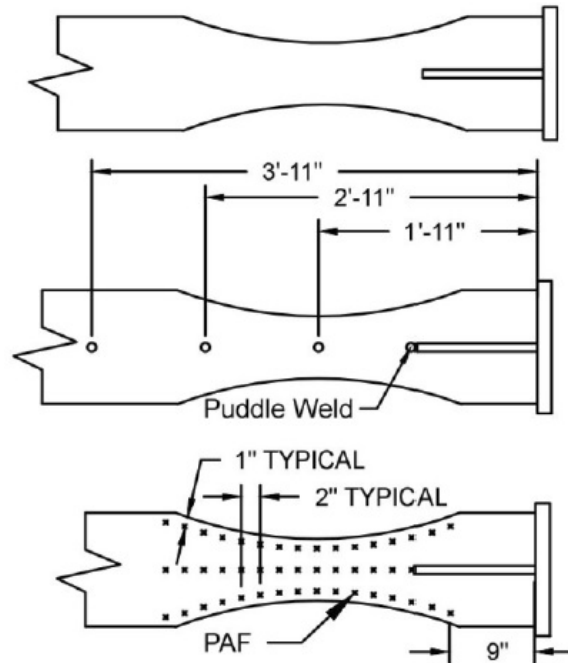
Flange layouts of puddle welds and PAFs (Eatherton et al. 2013).
